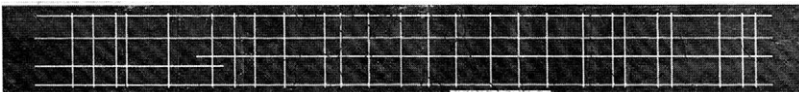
Superimpose image of the Beam with crack and bar arrangement
